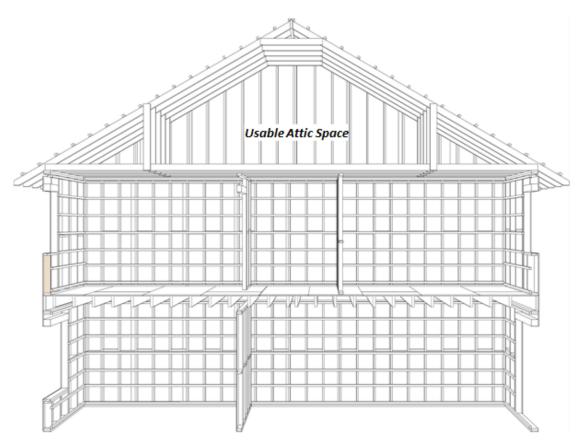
Revised section with cut-roof structure to facilitate the use of the attic space (Walsh 2021)
